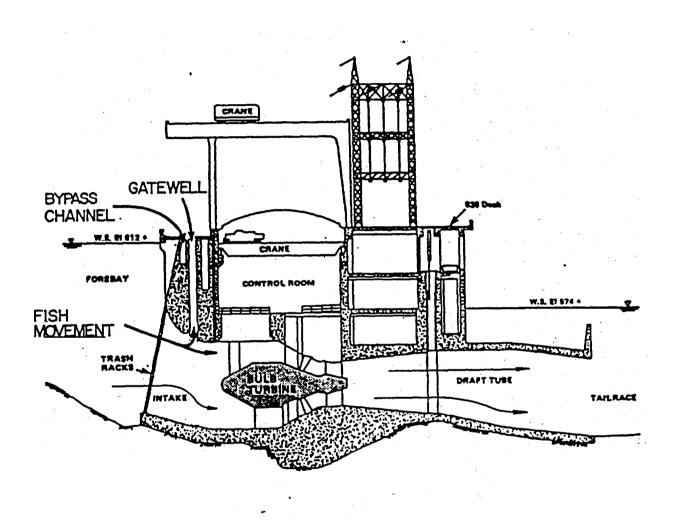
Section through Rock Island Dam second powerhouse indicating fish movement into gatewell system.
